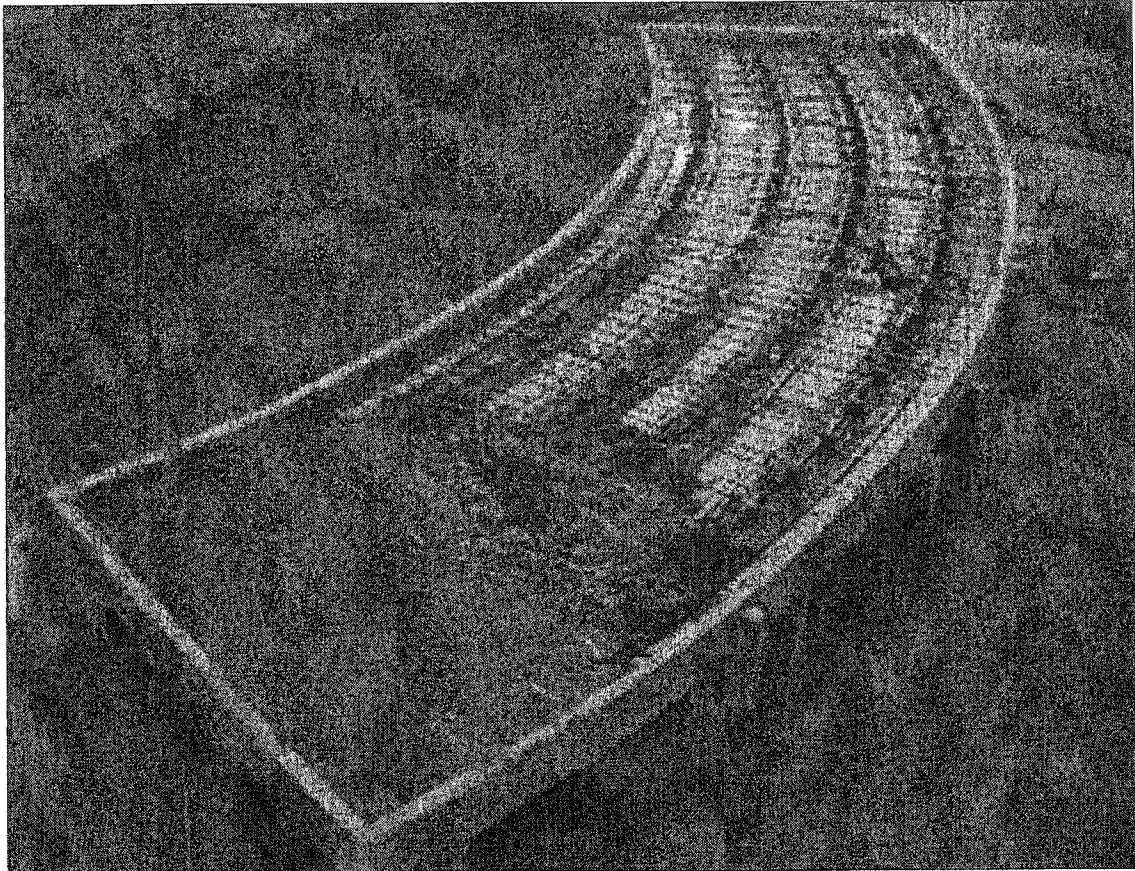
View of Bridge Model M2 during pouring the concrete slab
